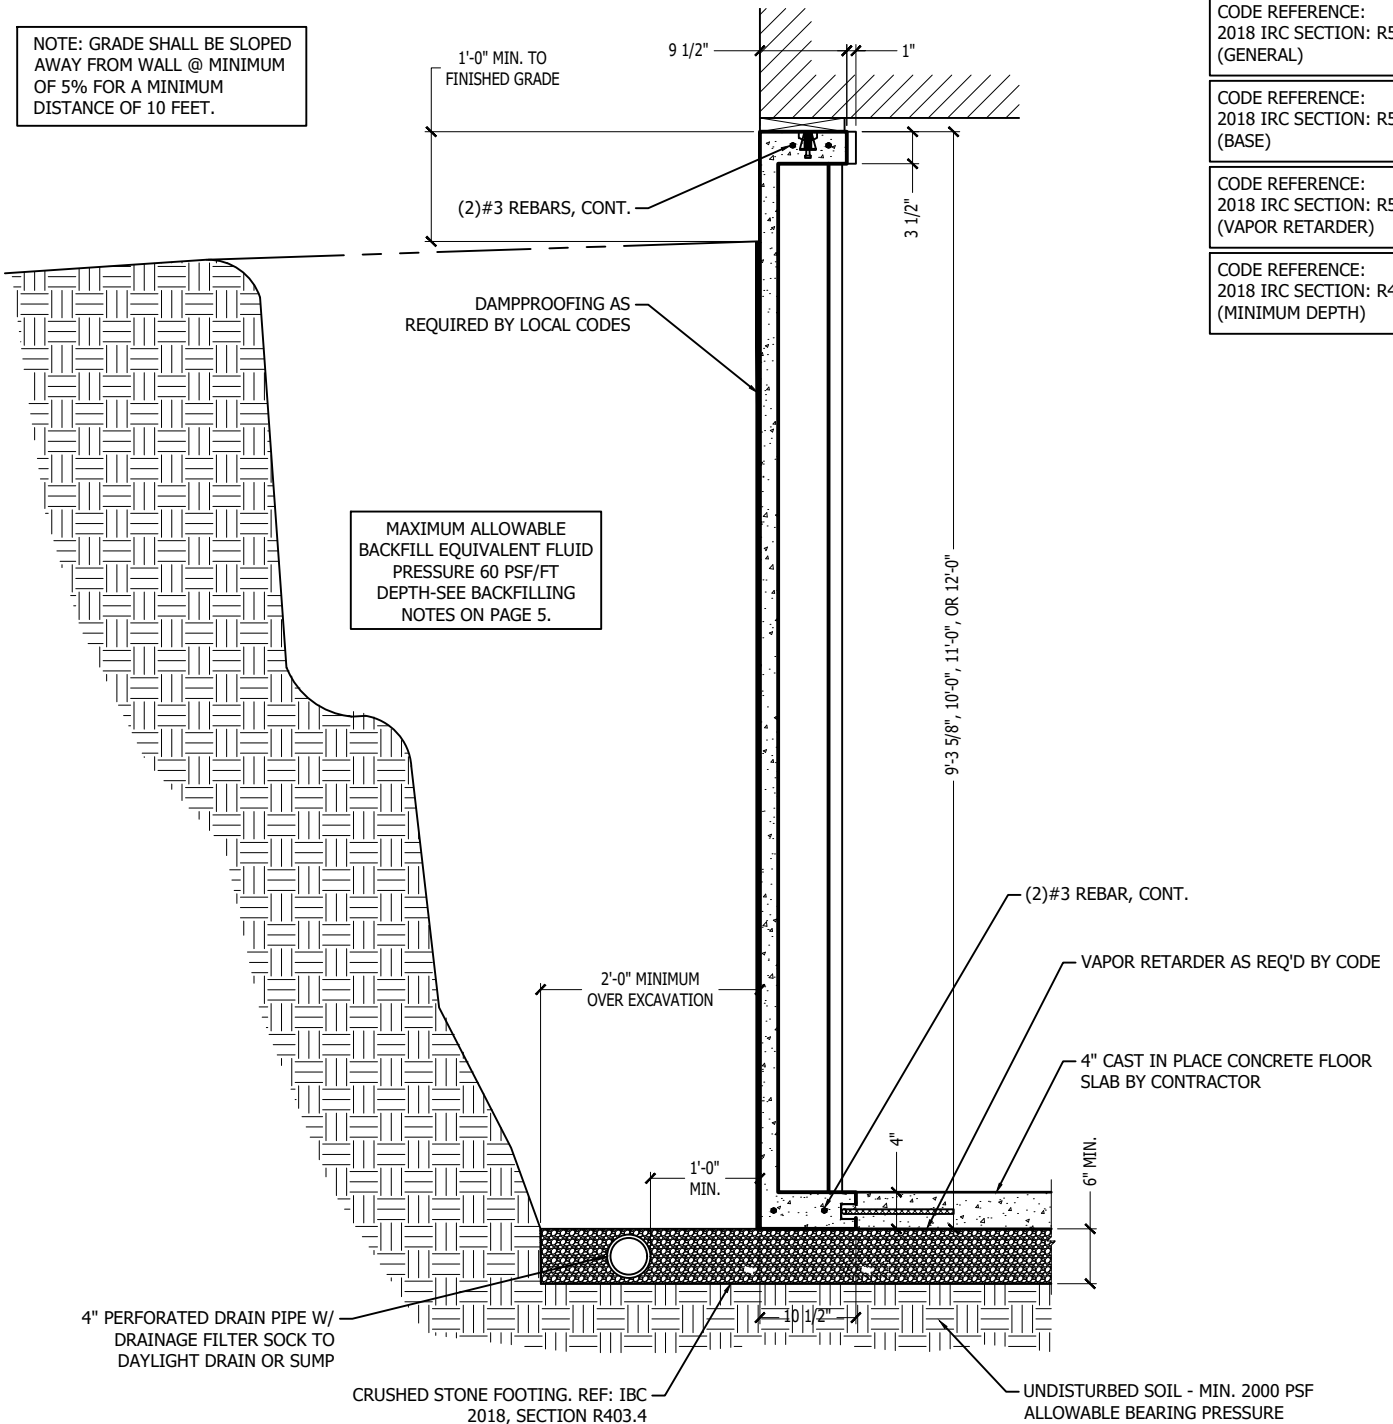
TYPICAL WALL SECTION 9'-3 5/8", 10'-0", & 12'-0" BASEMENT WALL PANELS
